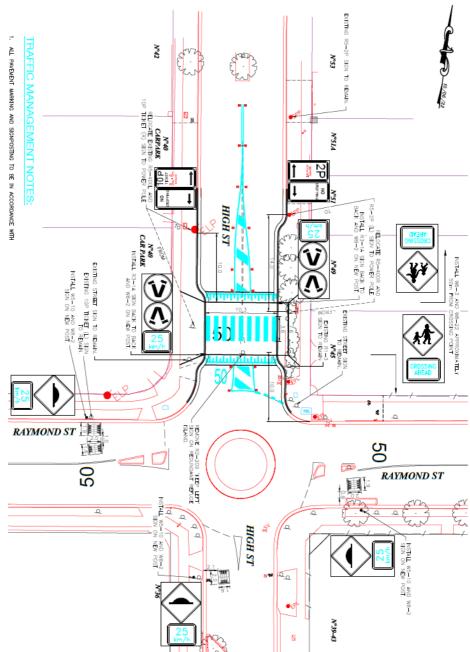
Concept plan of the proposed raised pedestrian crossing and speed cushions at the intersection of Raymond Street and High Street, Parramatta & Granville
